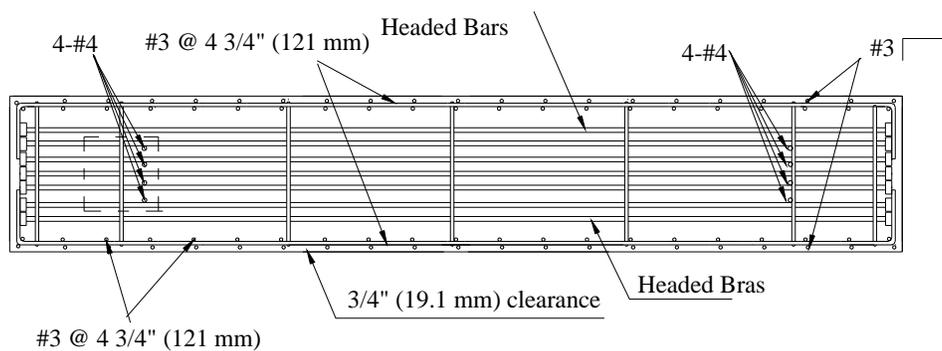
5- Reinforcement Layout (Section C-C)-Test Series V
